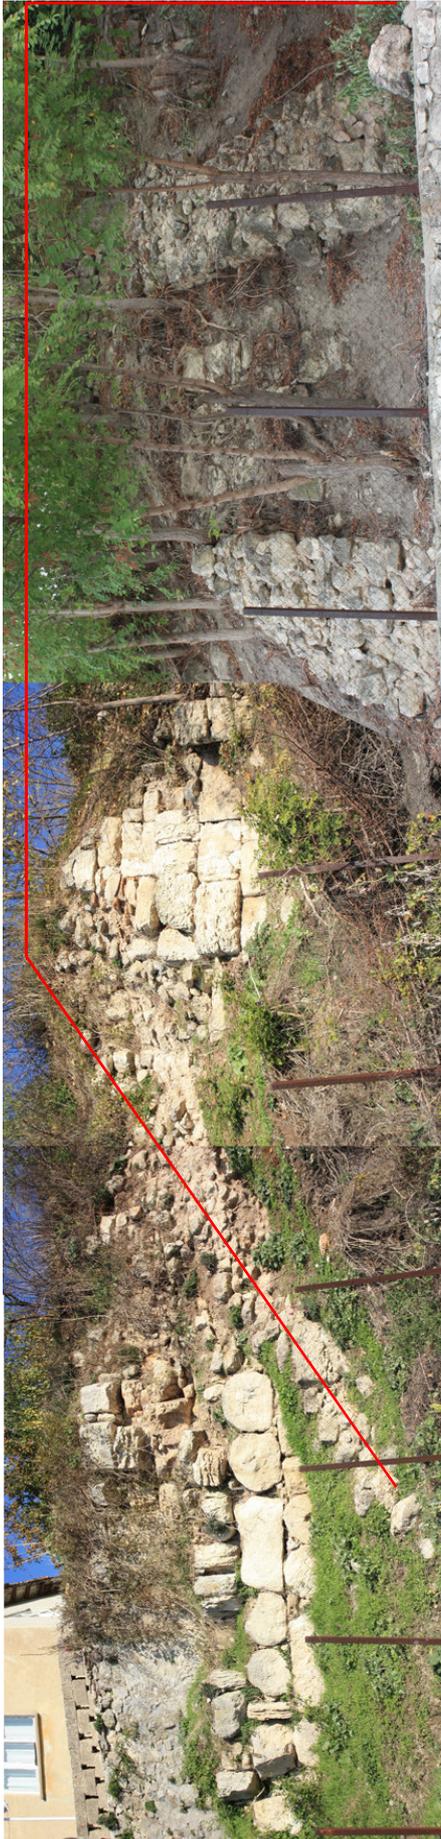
W4.1, façade, removing the plants, photo by author (2011).
